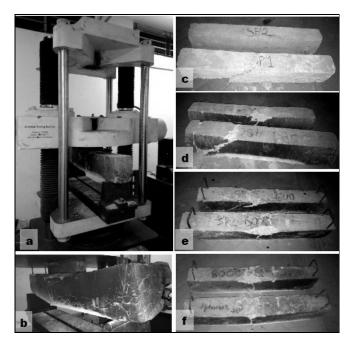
a) UTM setup for Bending test, b) Typical beam at bending , c) Un burnt beams, d) Beams burnt at 400°C, e) Beams burnt at at 600°C, and f) Beams burnt at at 800°C.
